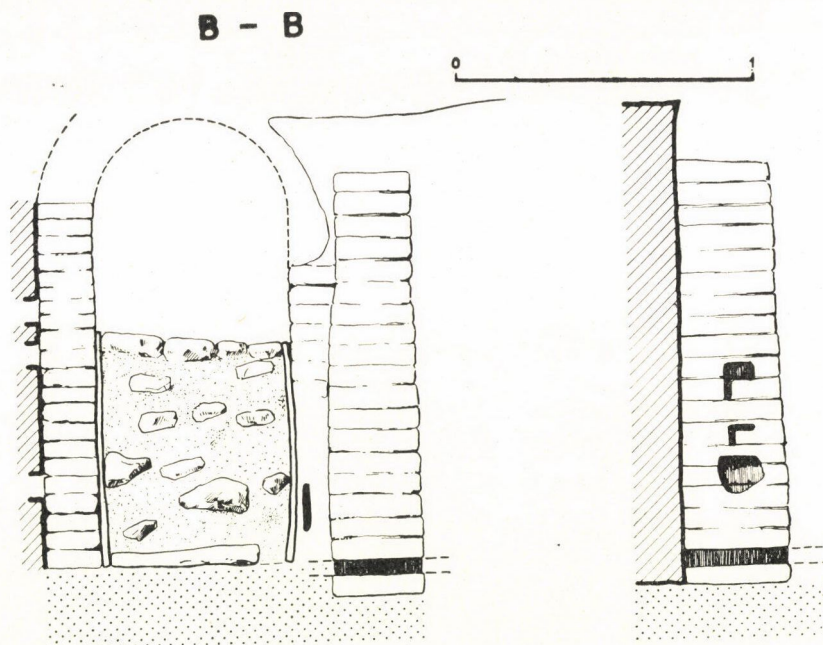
The door between rooms C/I 9 and 14; section B-B
